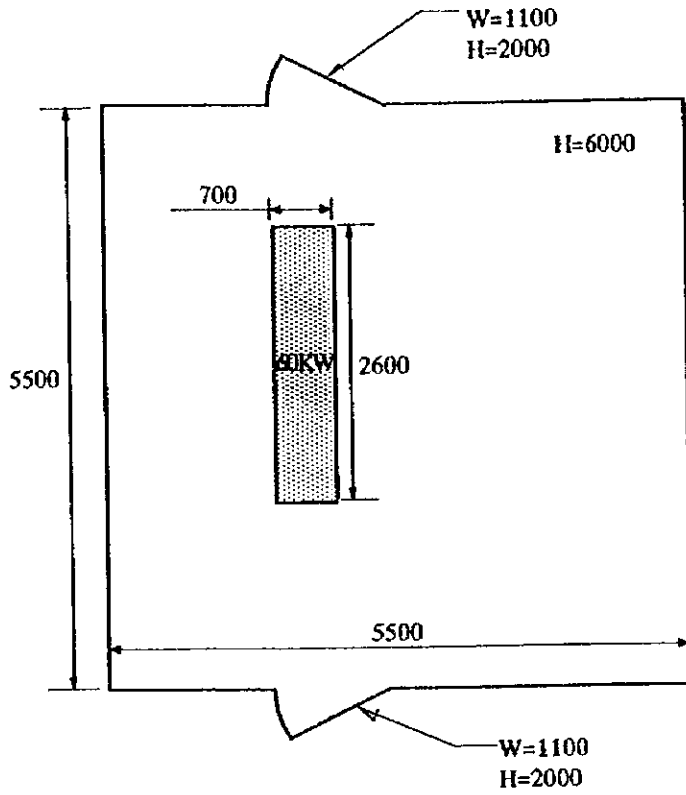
4 Layout Drawing of Zuunkhangai
